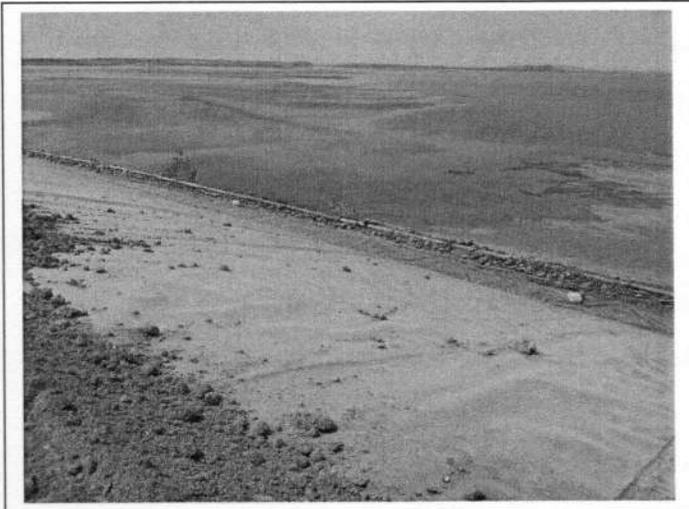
Installation of HDPE Liner on upstream slope of tailing Dam
